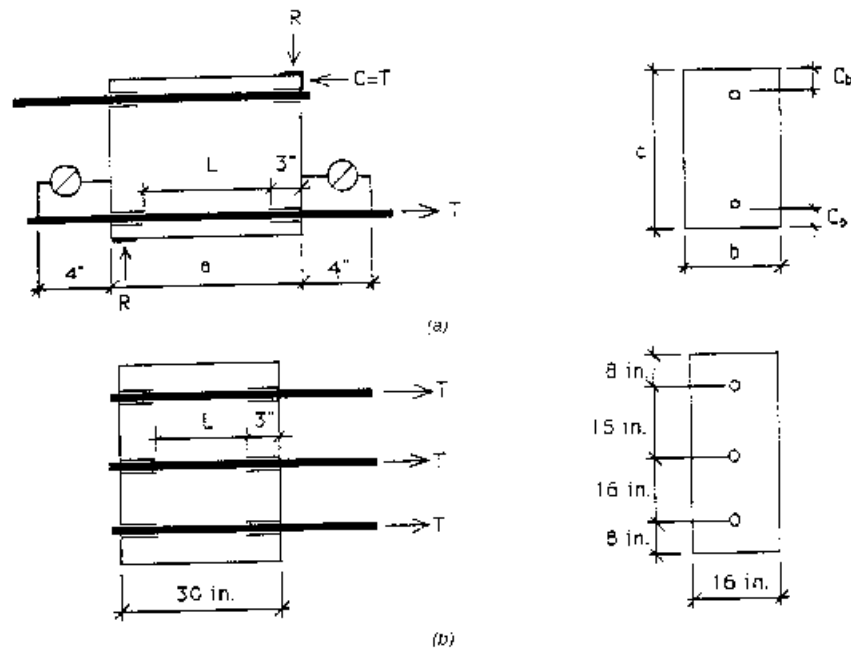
Test specimens: (a) View of beam specimens; (b) View of pull-out specimens.
